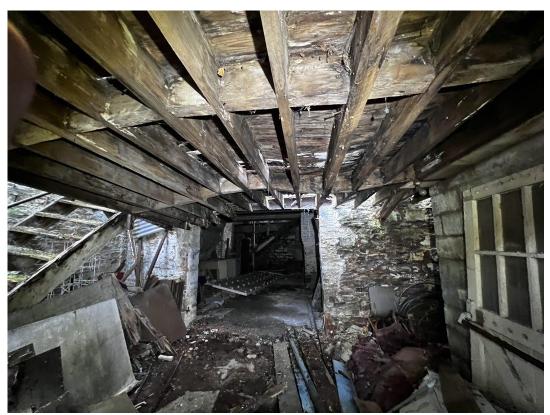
Left Annex interior. The floor timbers are rotten and dangerous to walk on, a survey of the upper floor was not possible. The building is in a state of dereliction and is suffering badly from the ingress of rainwater and is very damp. Photo by Liam O'Reilly
